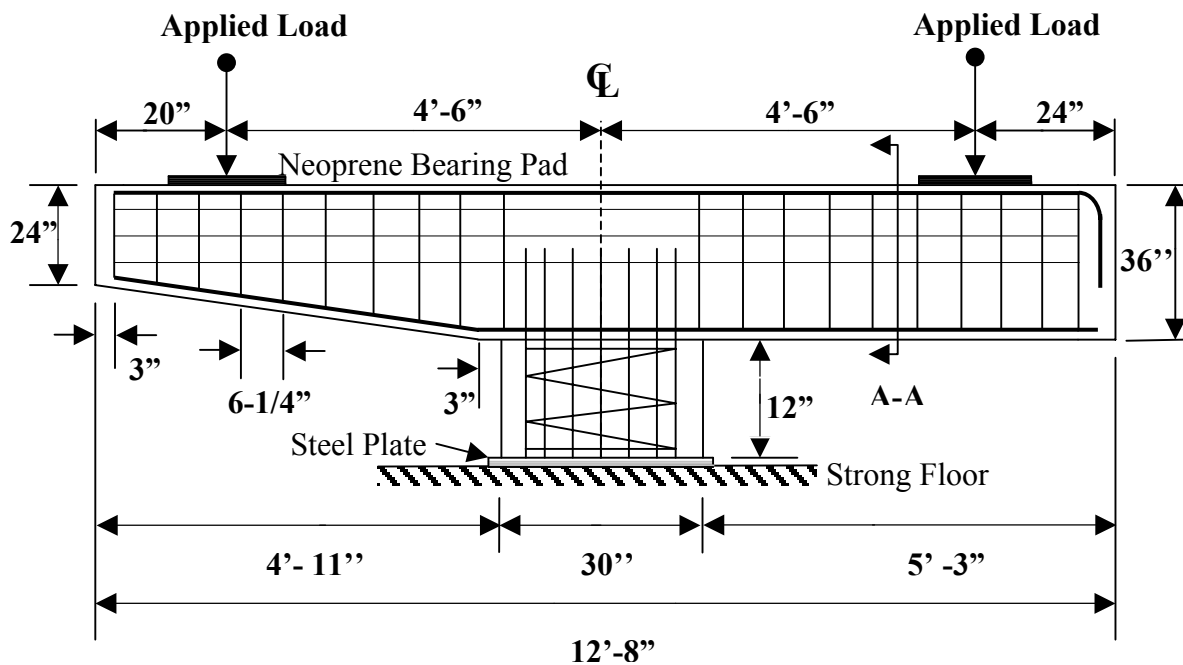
RC Bent Caps Test Specimen Details (Bracci et al., 2000)
